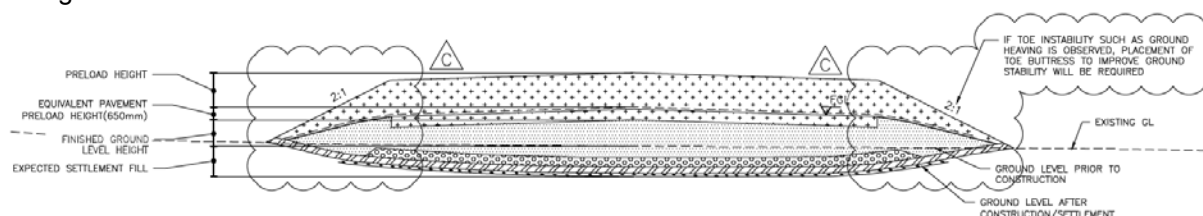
Typical Cross Section of Surcharge Embankment at TEL
